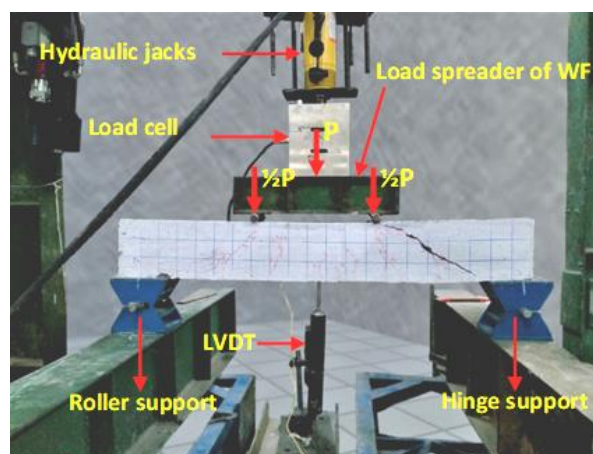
Test arrangement of bamboo-reinforced concrete beams.
